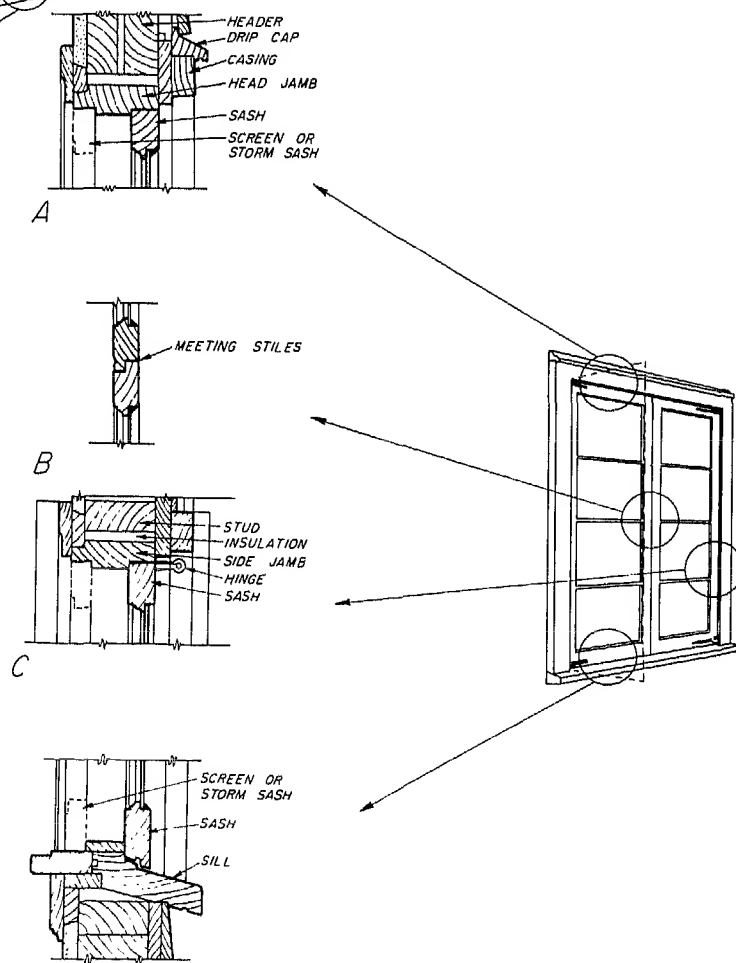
Outswinging casement sash. Cross sections: A, head jamb; B, meeting styles; C, side jamb; D, sill.
